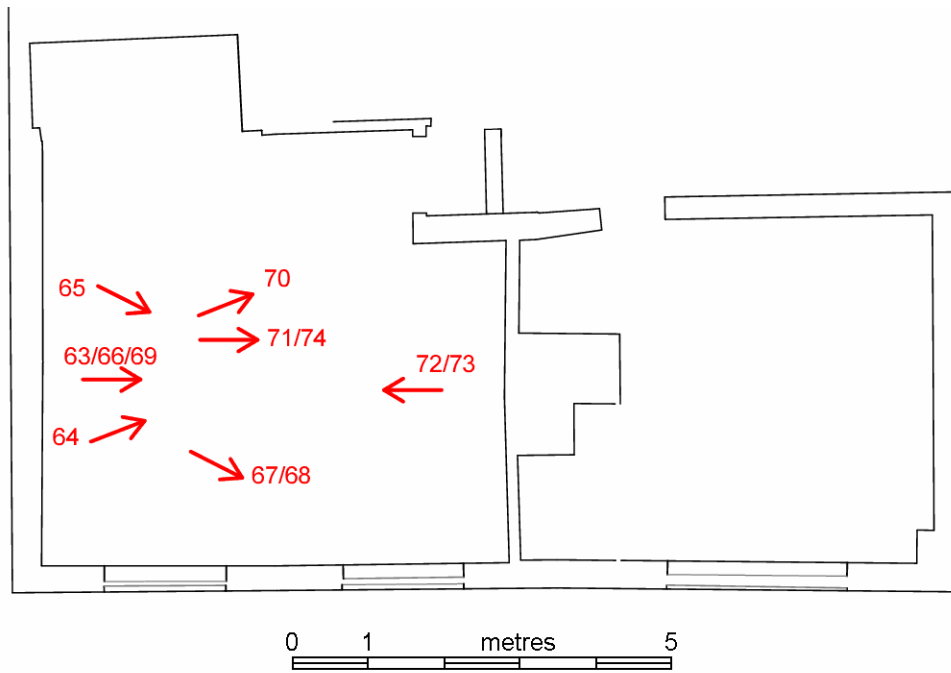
Room F7 roof photo plan (*scale 1:100*)
